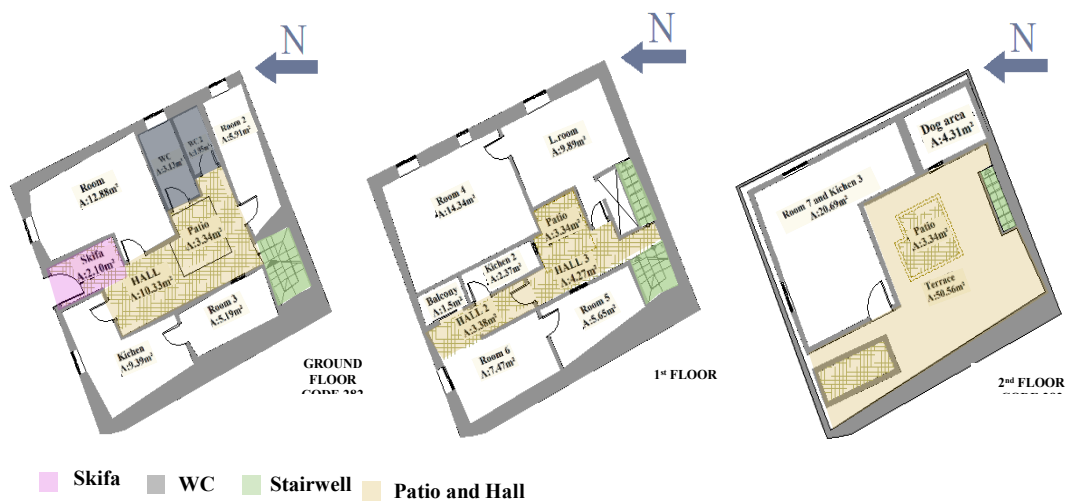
Ground floor plan, 1st and 2nd floor code 282.
